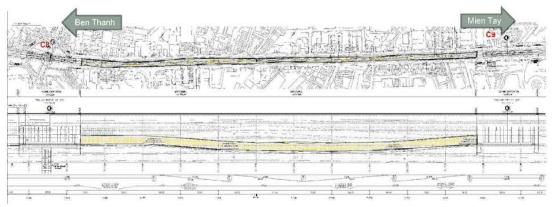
Plan and Profile between C8 and C9 on FS
